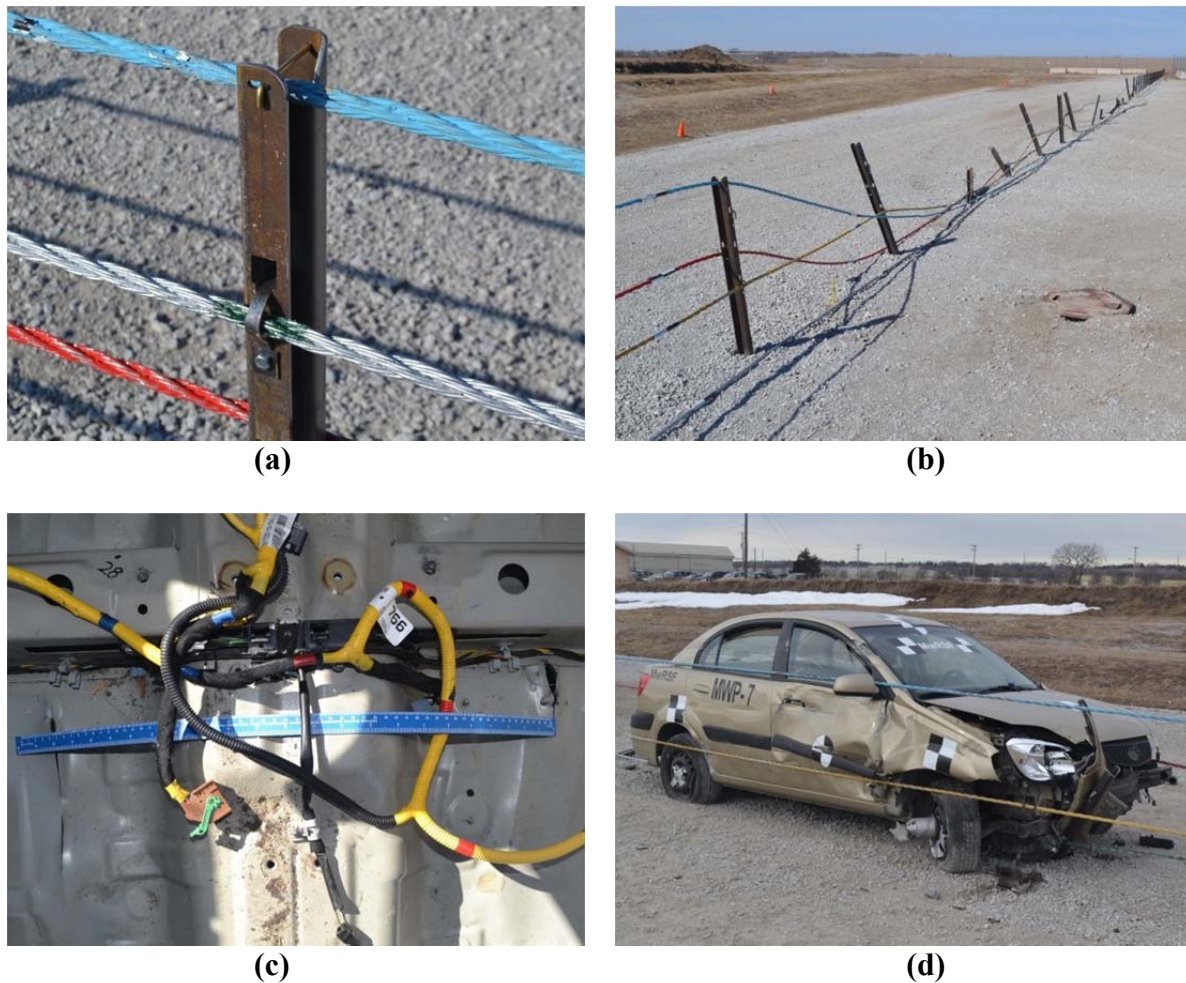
Test No. MWP-7: (a) Corner Radii Treatment; (b) Barrier Damage; (c) Floor Pan Tears; and (d) Vehicle Damage.
